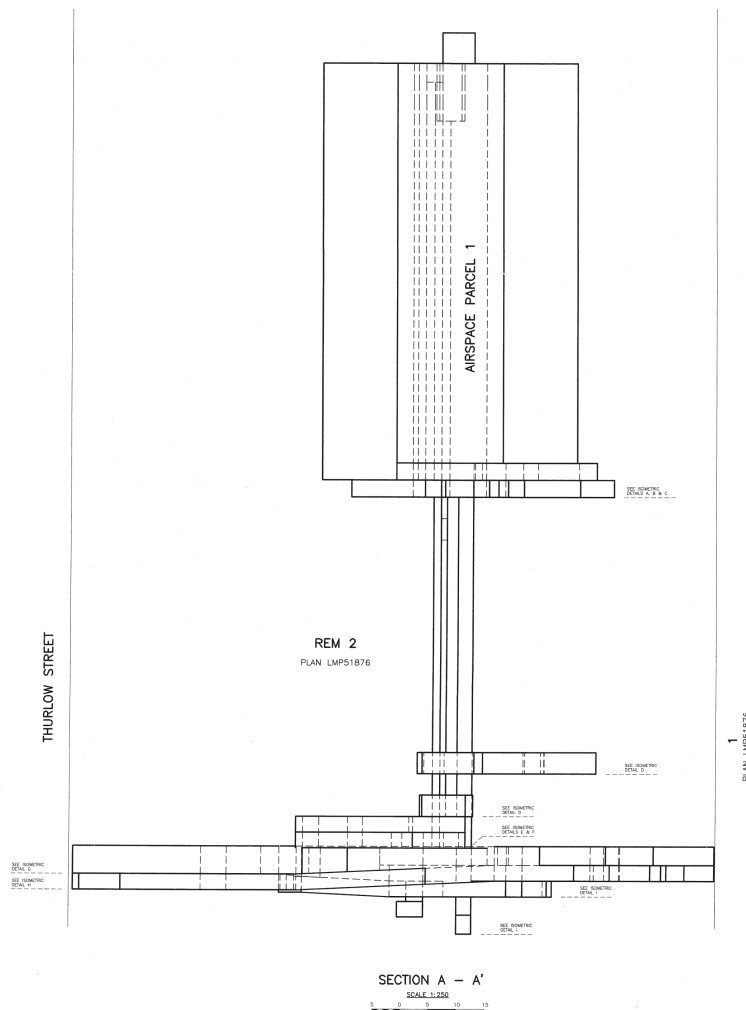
Cross-section of Air Space Parcel 1 within Rogers Tower, Air Space Plan 14488. (Source: Land Title & Survey Authority.)
